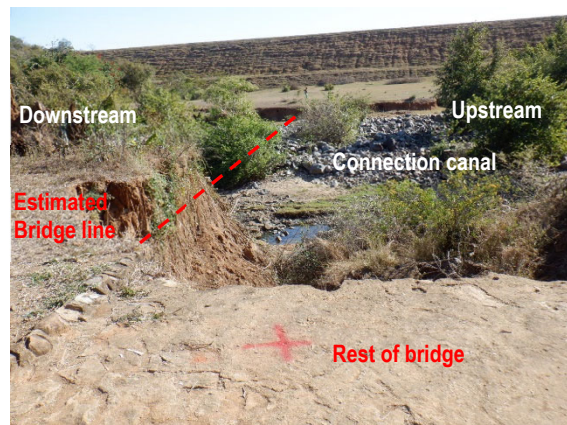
Collapses on the Left Bank Side Wall, the Washed Away of a Bridge
